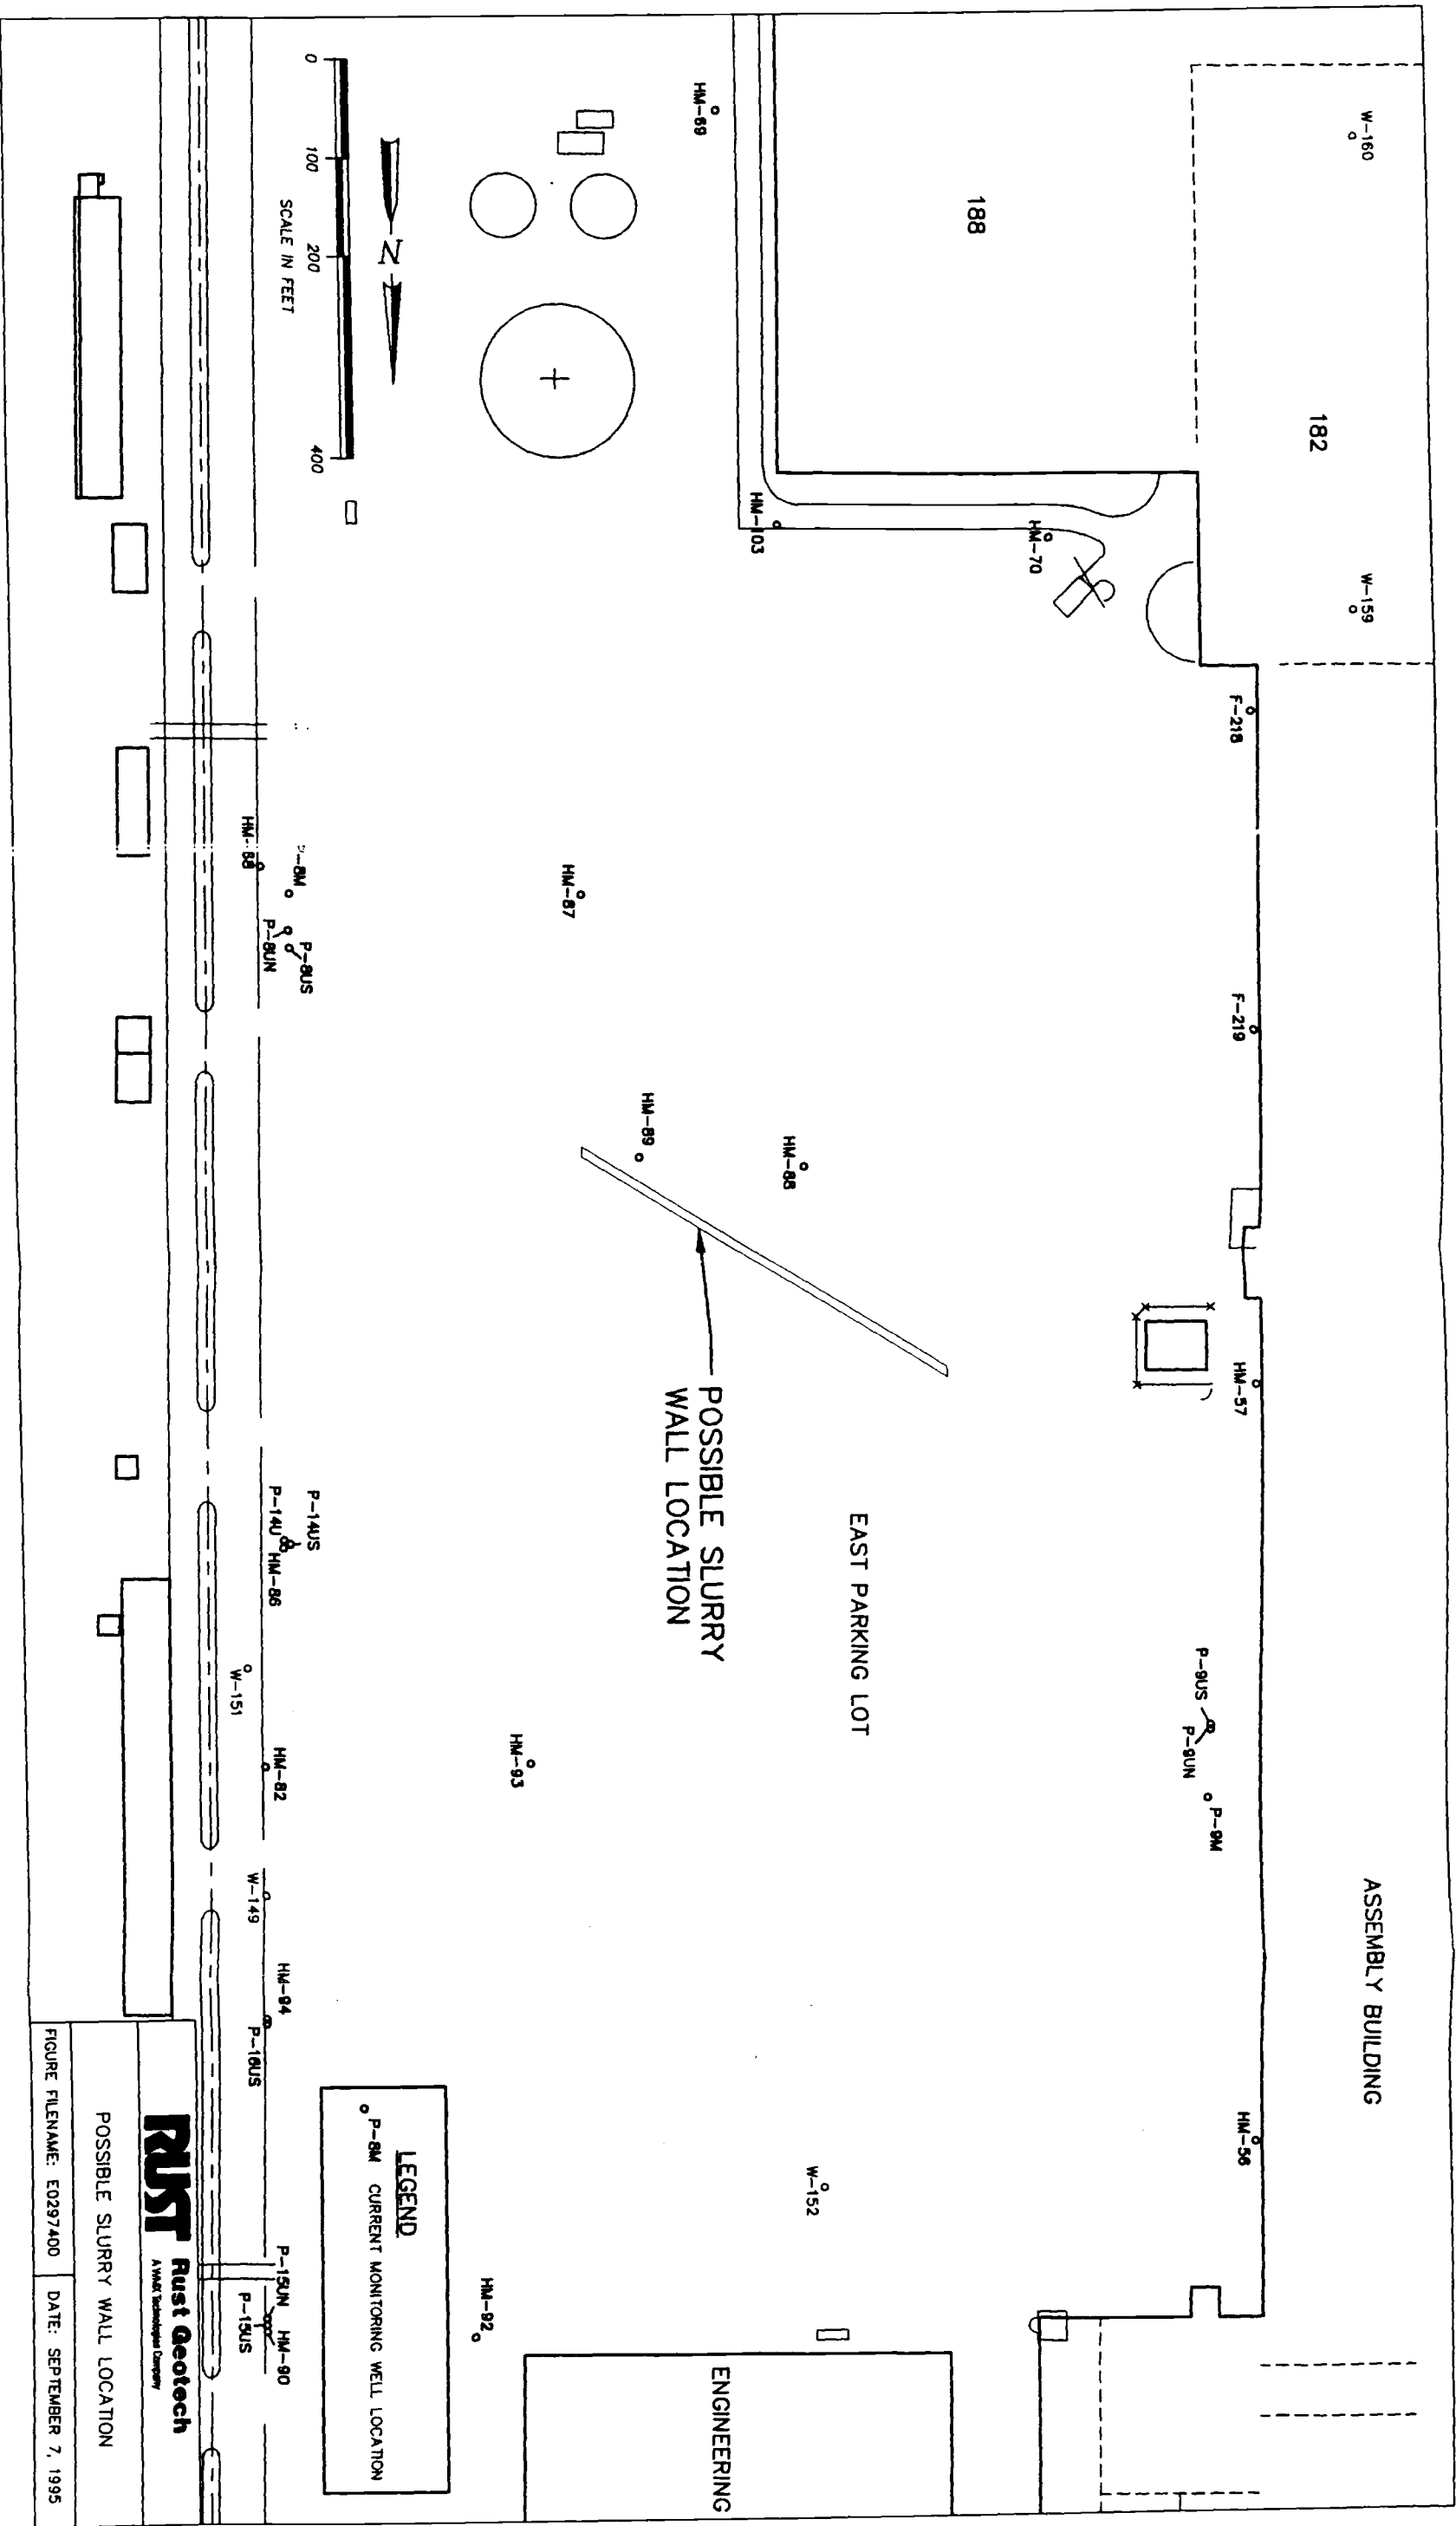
Possible Slurry Wall Location in East Parking Lot.
